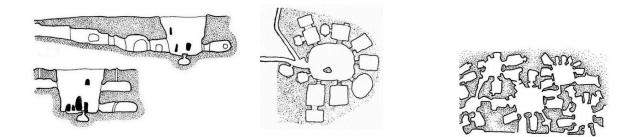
A typical plan and section of Matmata'scave dwelling (Boukhchim et al., 2017)
